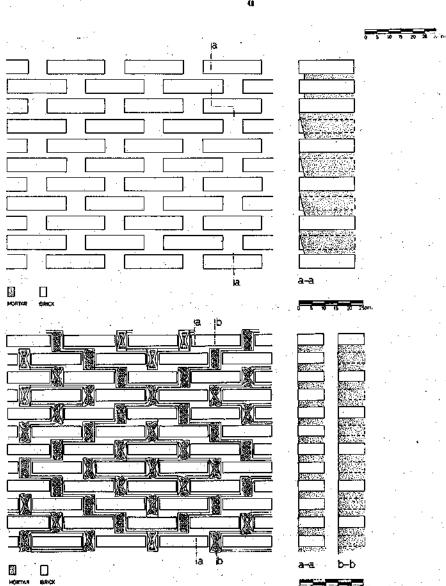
Horizontal Bond, half brick staggering, narrow rising and bed joints.
